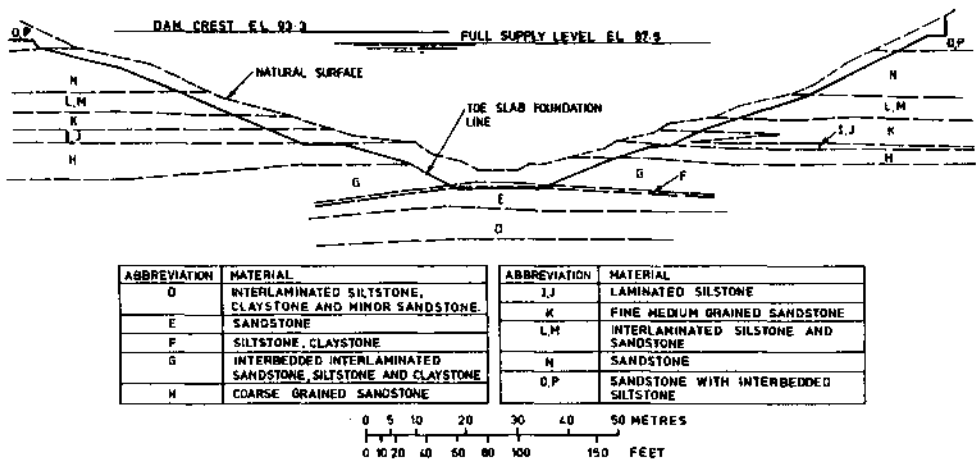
Cross-section along the grout cap foundation at Mangrove Creek Dam. From MacKenzie & McDonald (1985).
